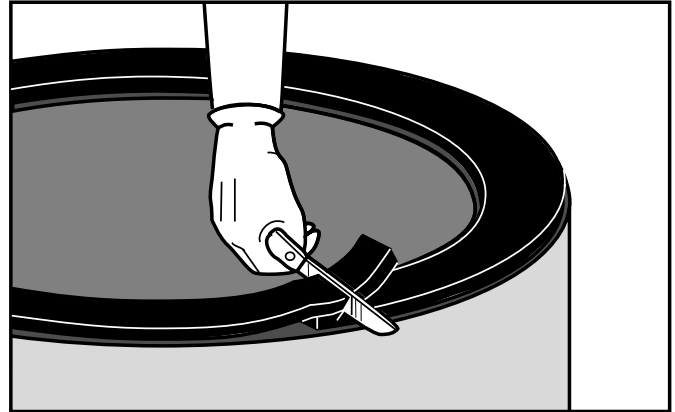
Join Premstrip by tapering the ends 45° with a hot knife.
